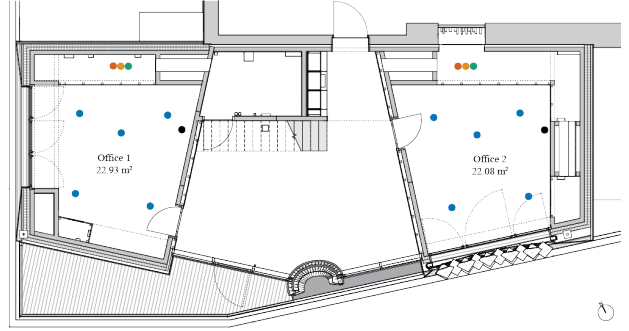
Floor plan of HiLo with the location of sensors indicated by dots.
